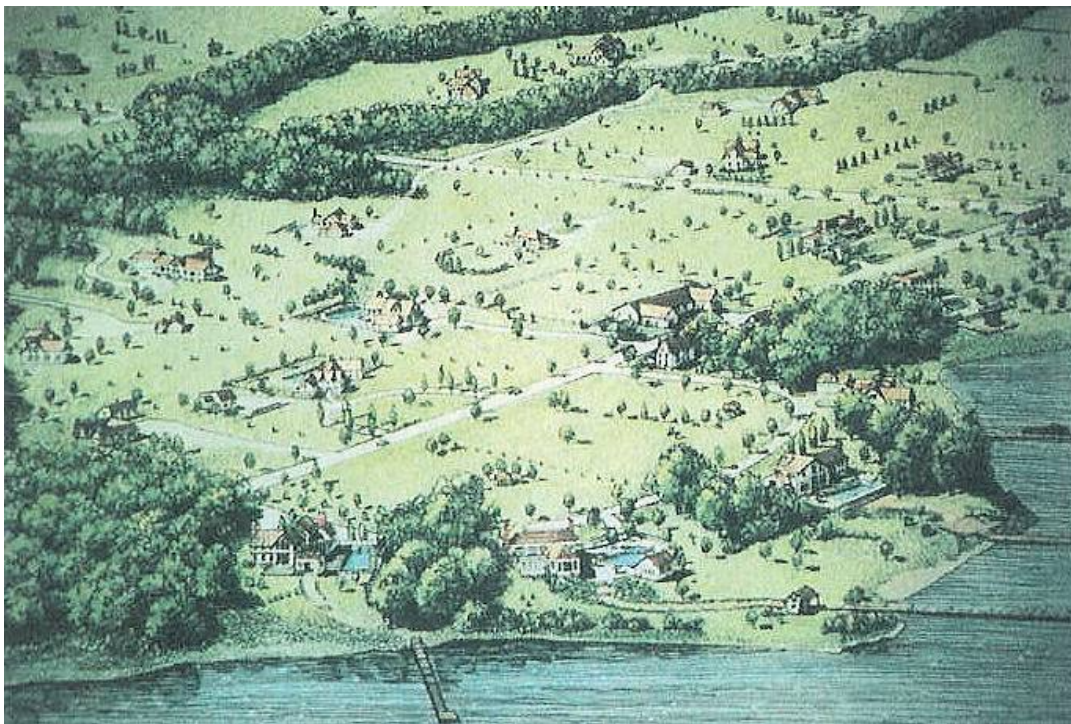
Site Plan and Aerial View of Conventional Subdivision Design for Remlick Hall
